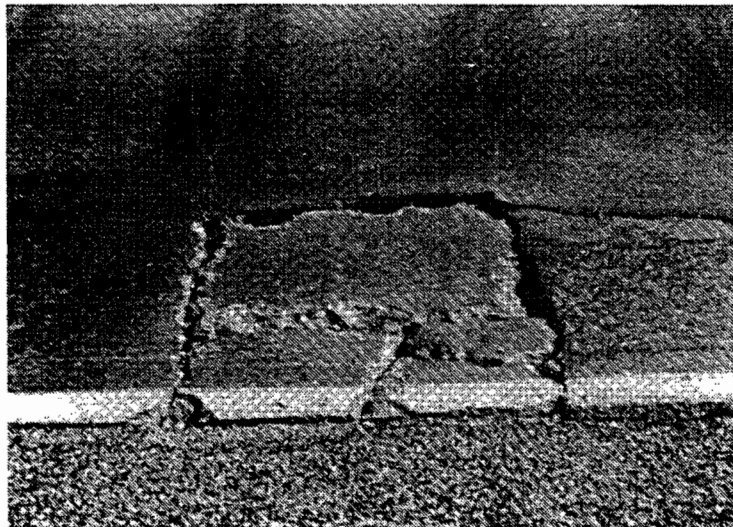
Punchout formed by two closely spaced transverse cracks, one longitudinal crack, and the pavement edge
